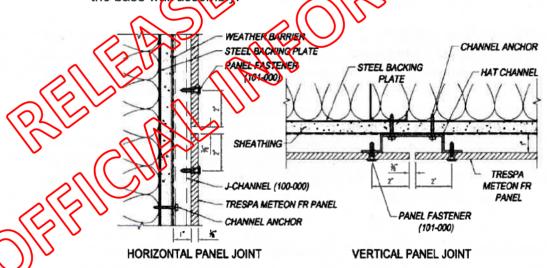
TS110 EXPOSED FASTENER SYSTEM
